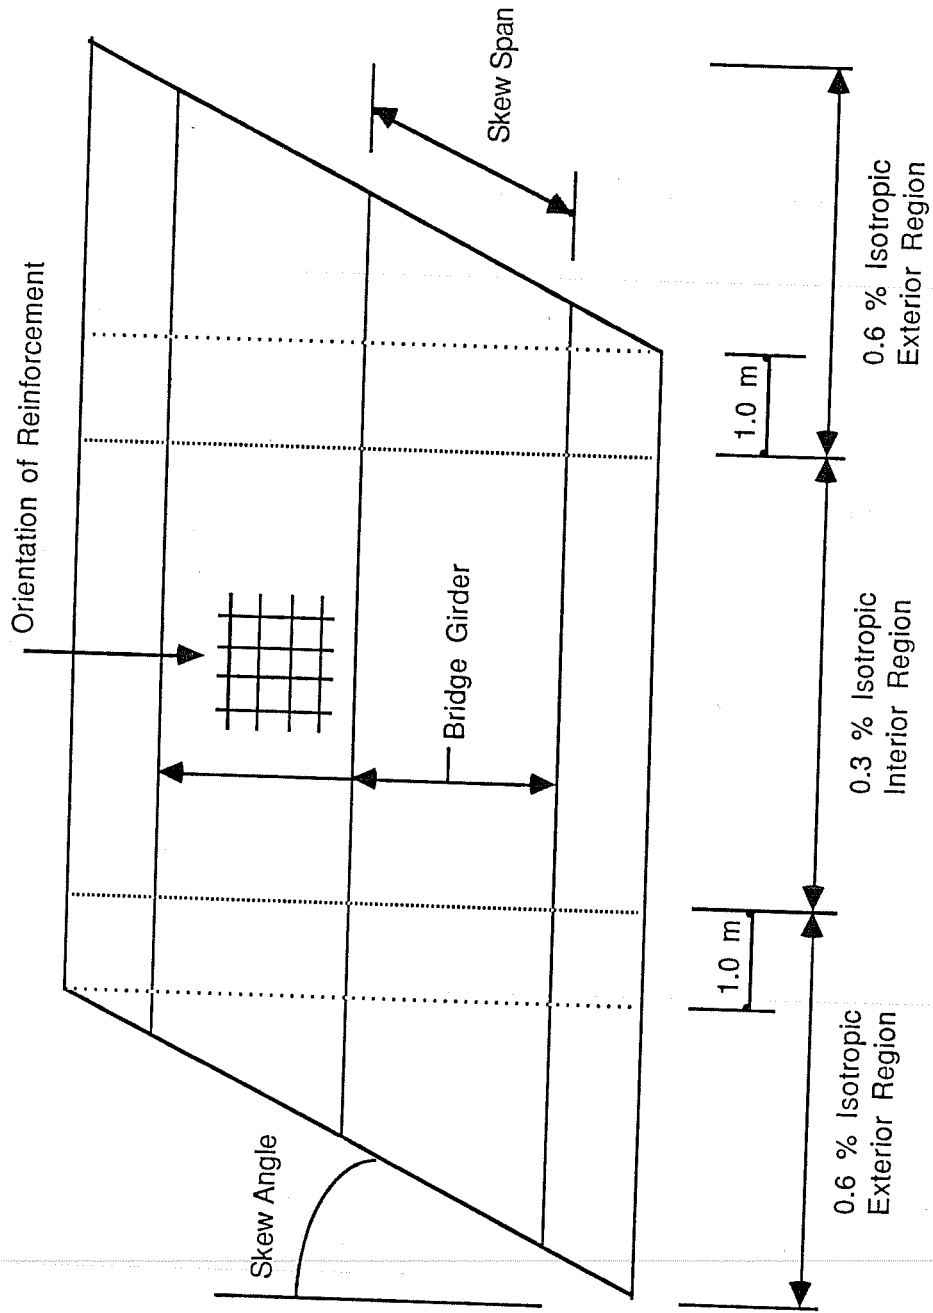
Reinforcement of Ontario-type skew bridge deck
